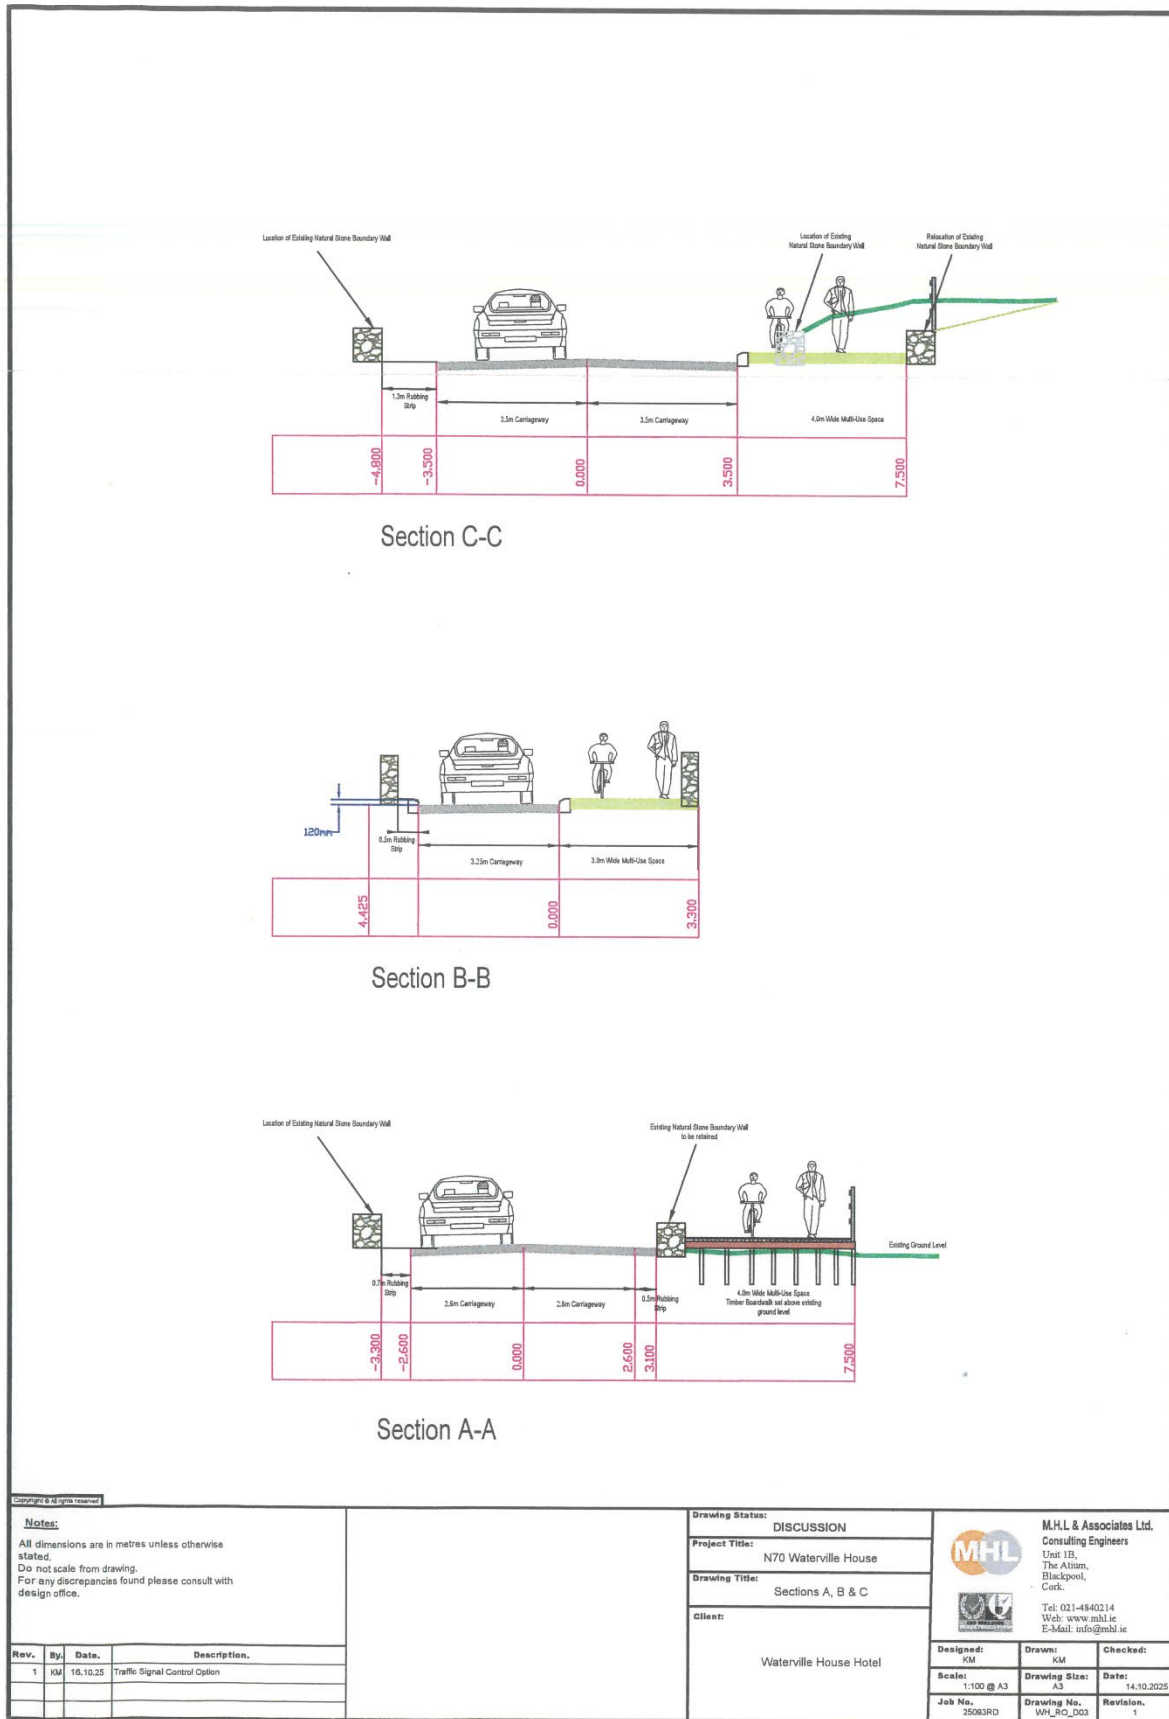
MHL Alternative Proposal – Cross Sections
